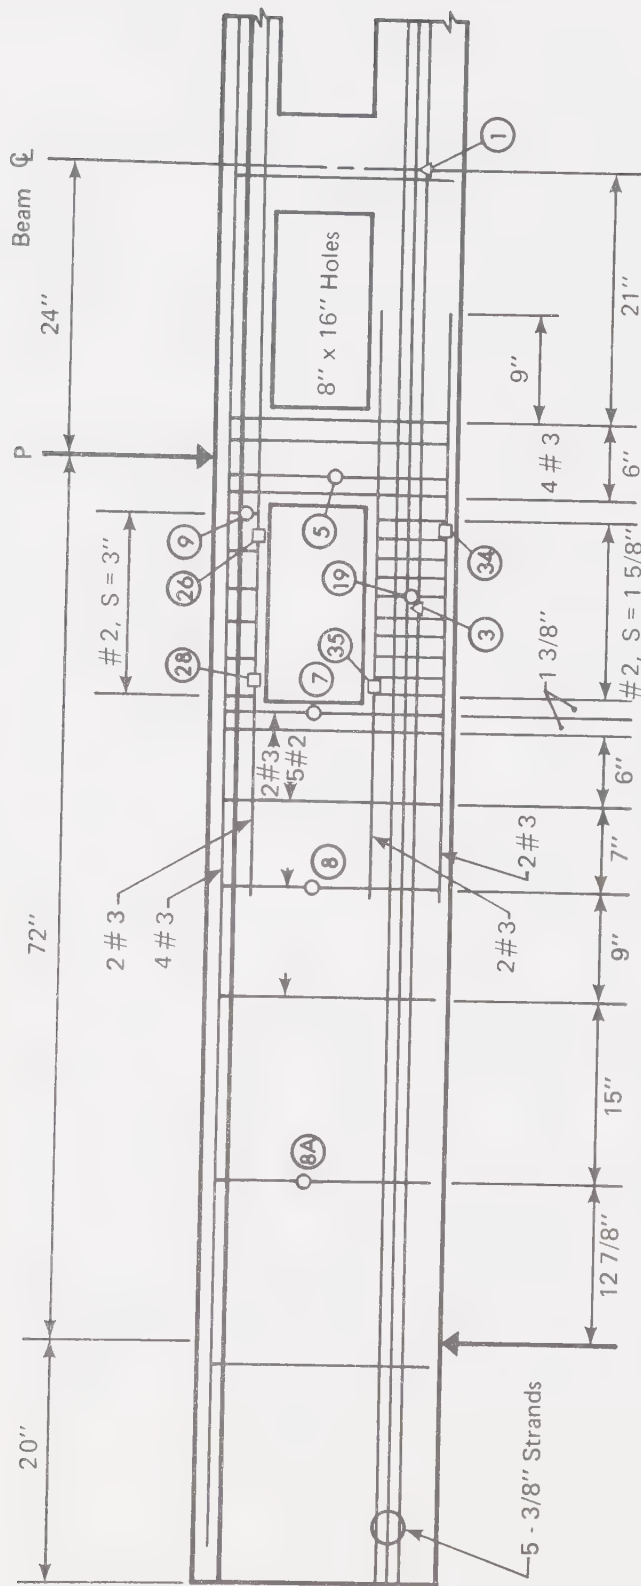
Reinforcement Details and Strain Gage Locations for Beam 24-16-6
